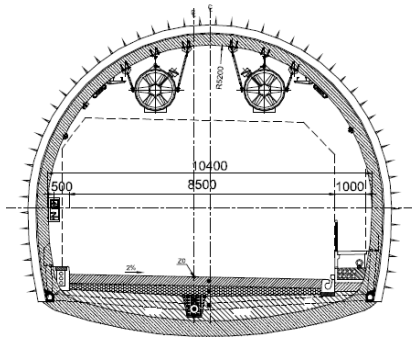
Profile of new transported tunnel Fig. 24 - Profile of existing railway tunnels N°24
